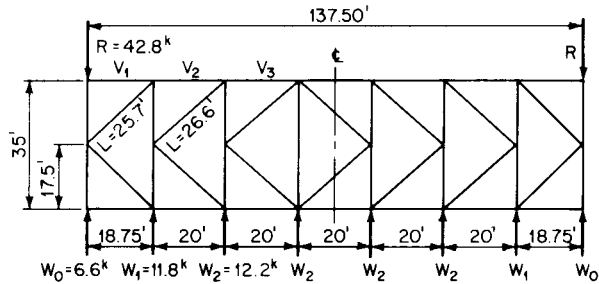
Lateral bracing system for deck-girder bridge.
